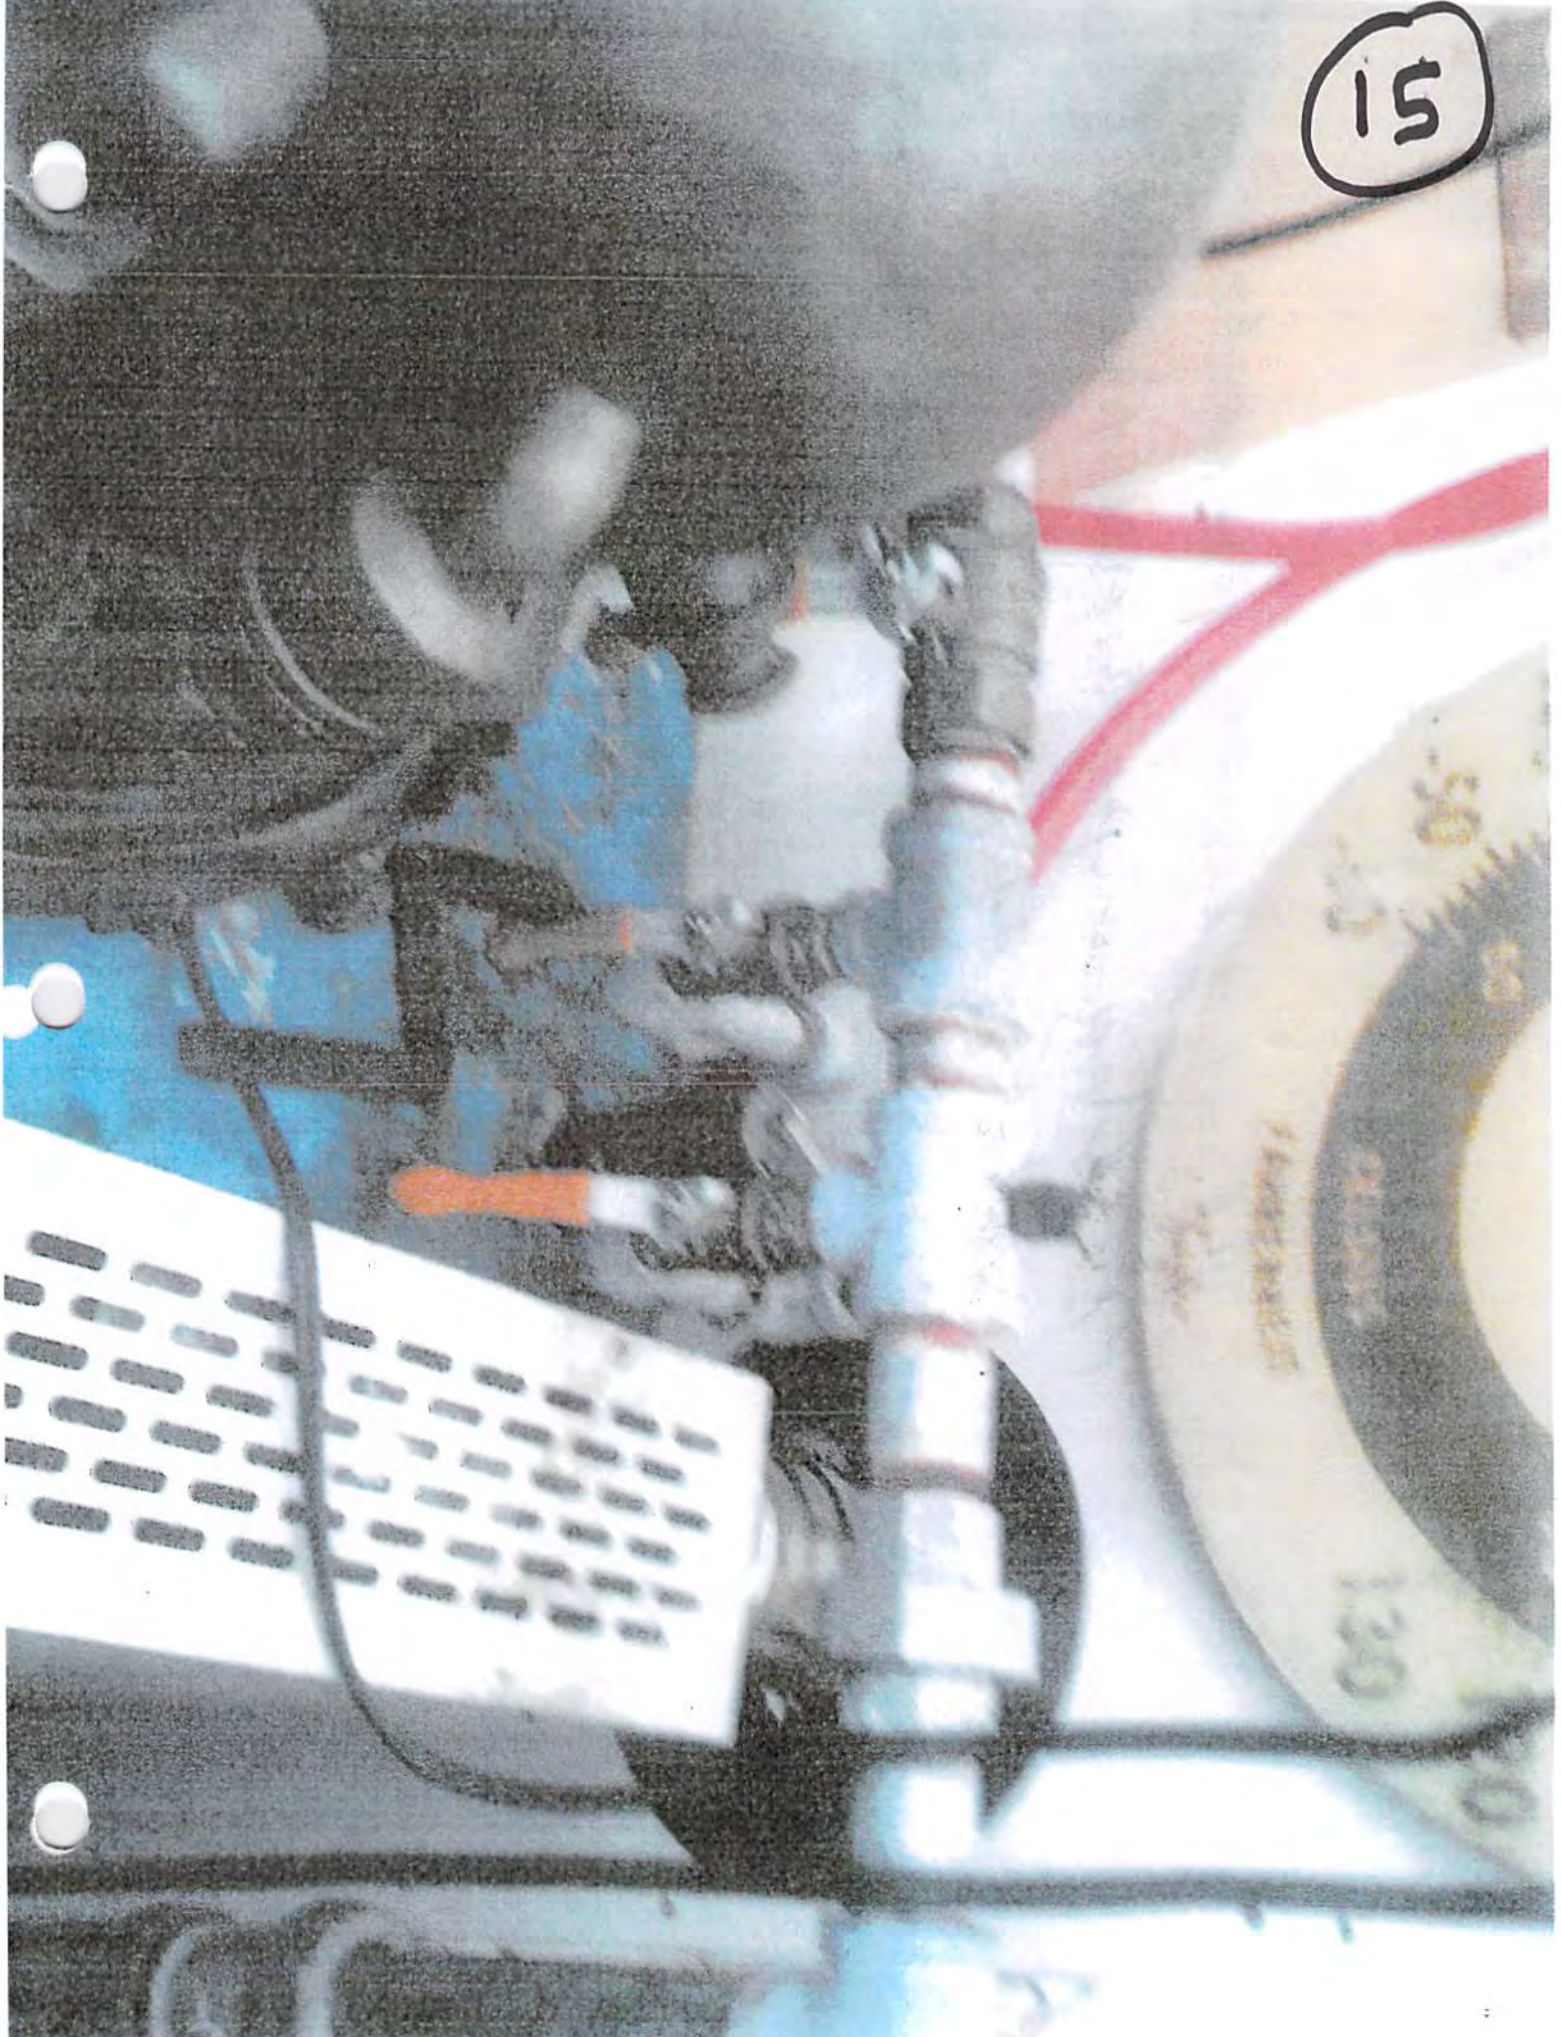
shows the 120,000 BTU Boiler to heat the Permanent Concrete Floor.
